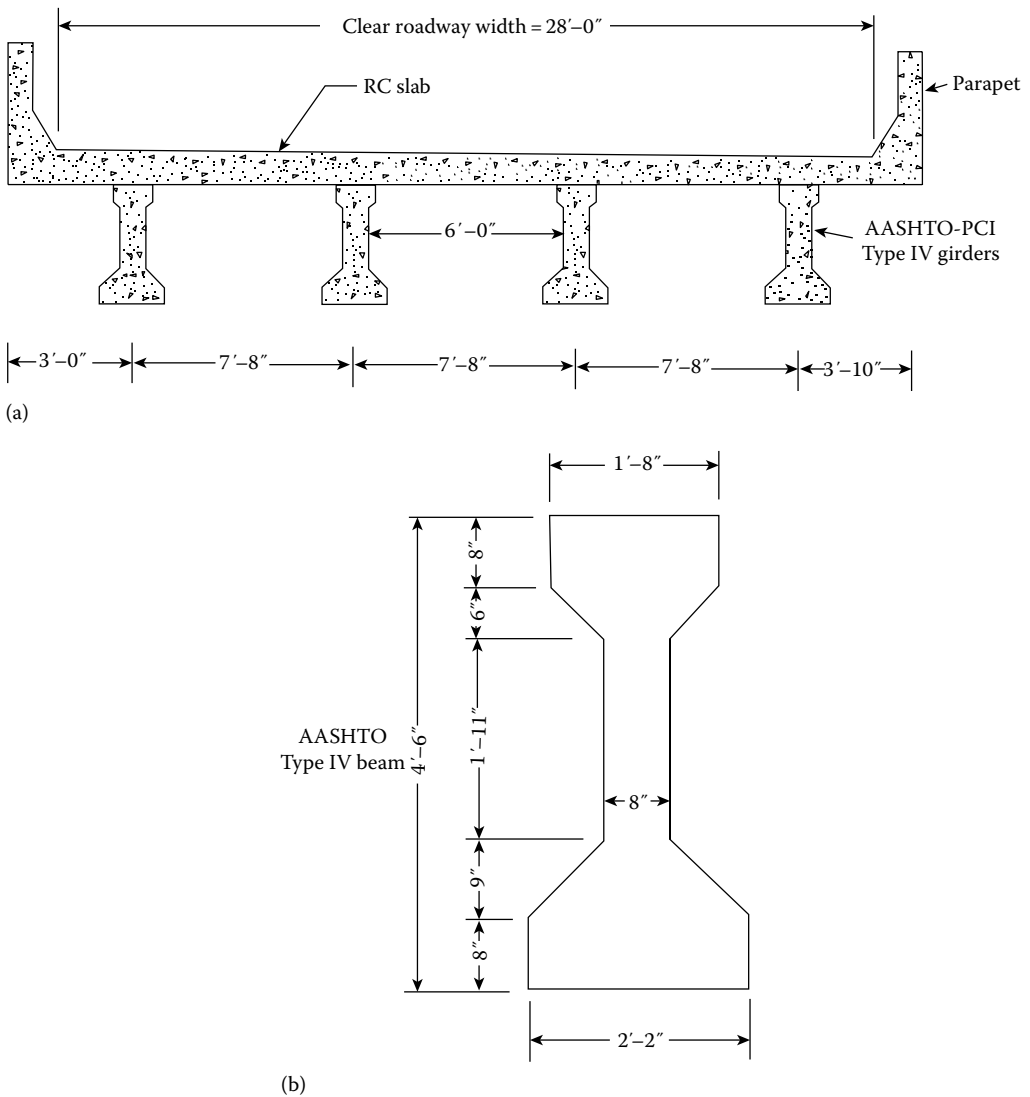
Bridge cross section for Example 3.2. (a) Bridge cross section and (b) cross section of pre-stressed concrete girder bridge for Example 3.2.
